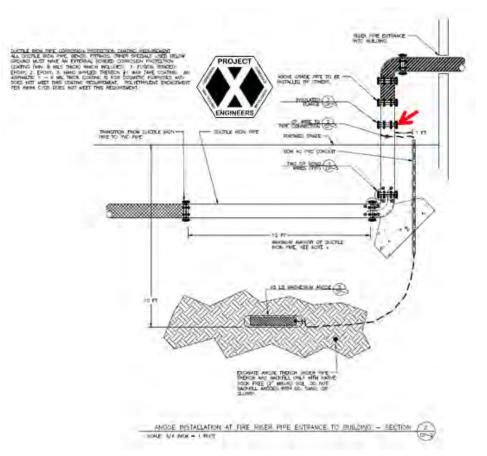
Fire Riser Detail: Install Isolation joint at red arrow
